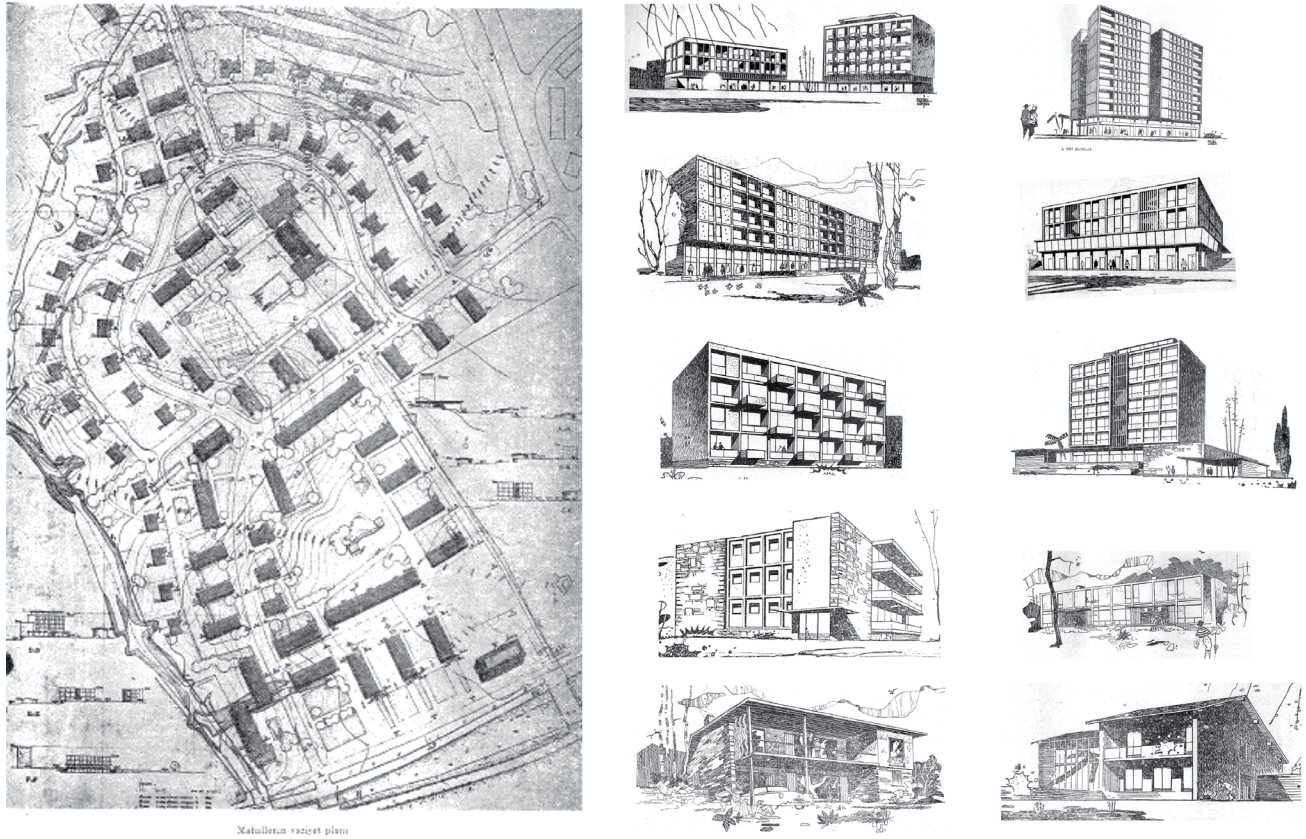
Levent 4 Neighborhood Site Plan and Perspective drawings (arranged by author based on Arü,1956)
